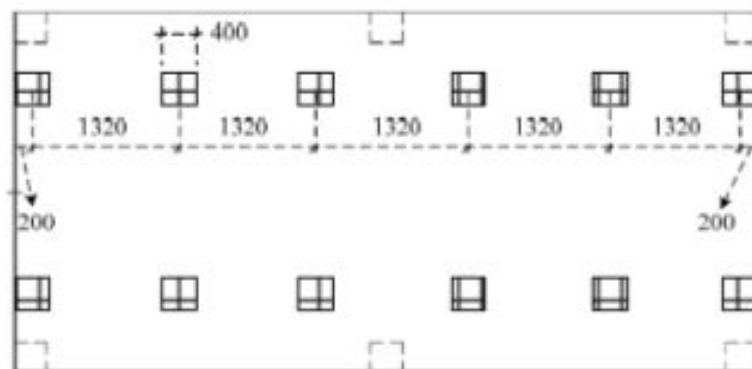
Plan view of the FST with point supporting form used in the test [69].
